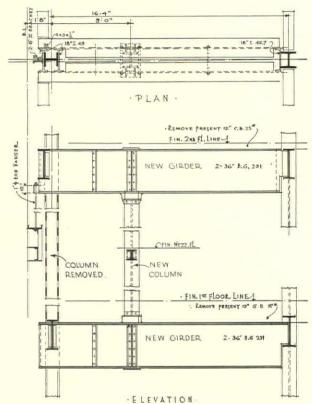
Field connections of girders with heavy reactions can be simplified by building a short length of column on the end of the girder. This reduces the field connection to an ordinary column splice
